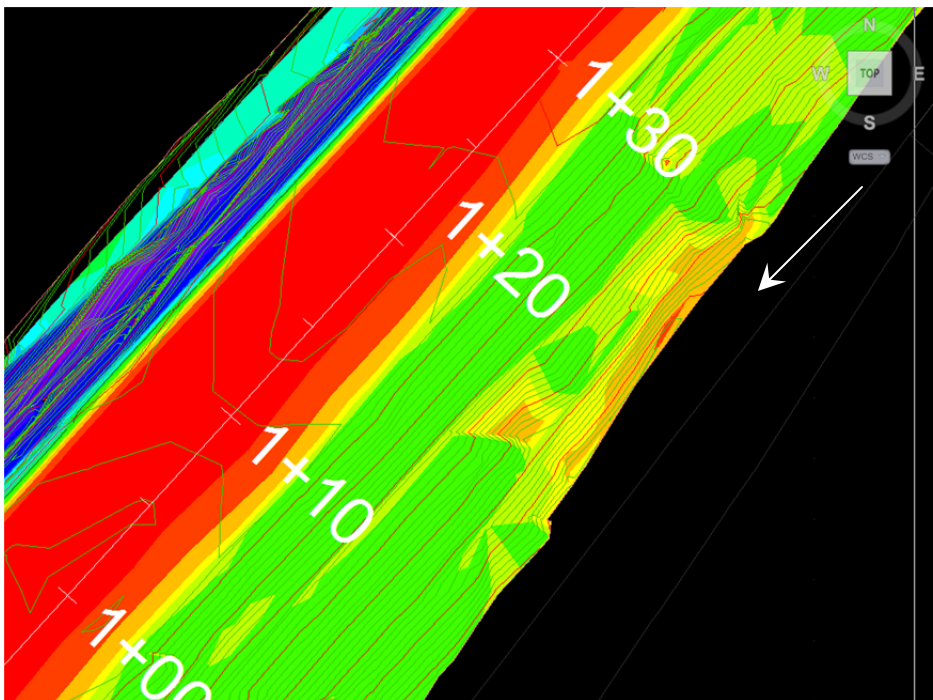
~SW view of underbuilt US toe slope around station 1+20. A screenshot of the as-built isopach (from 2012/0313) is included to better highlight this slightly underbuilt area. This area is planned to be built up to grade in the coming days.
